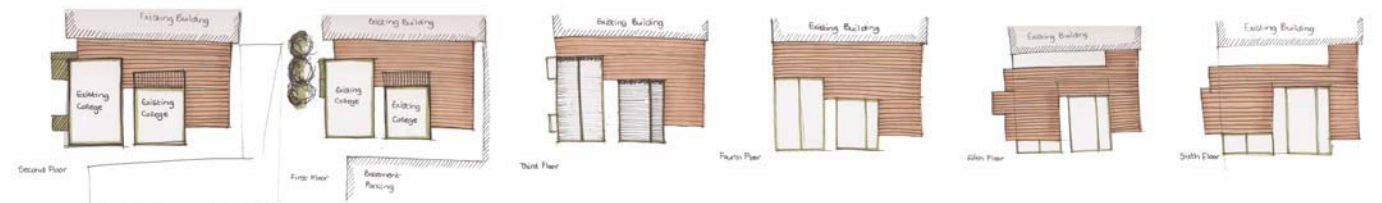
Floor plans of first to sixth floors of proposal on Site 1
